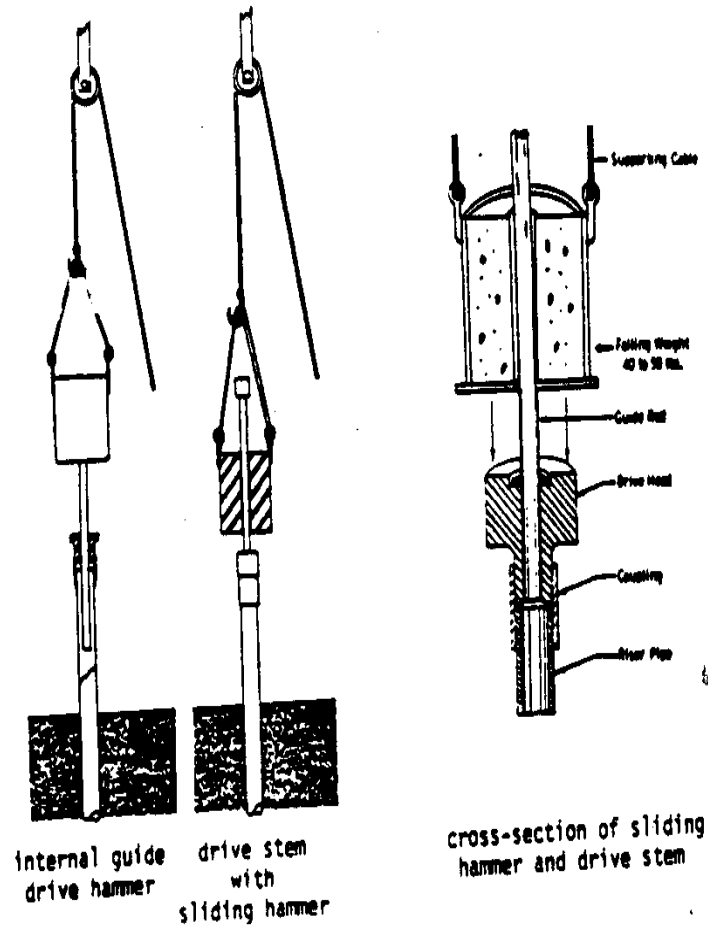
Heavy duty sliding Hammer and Drive Stem Assembly
